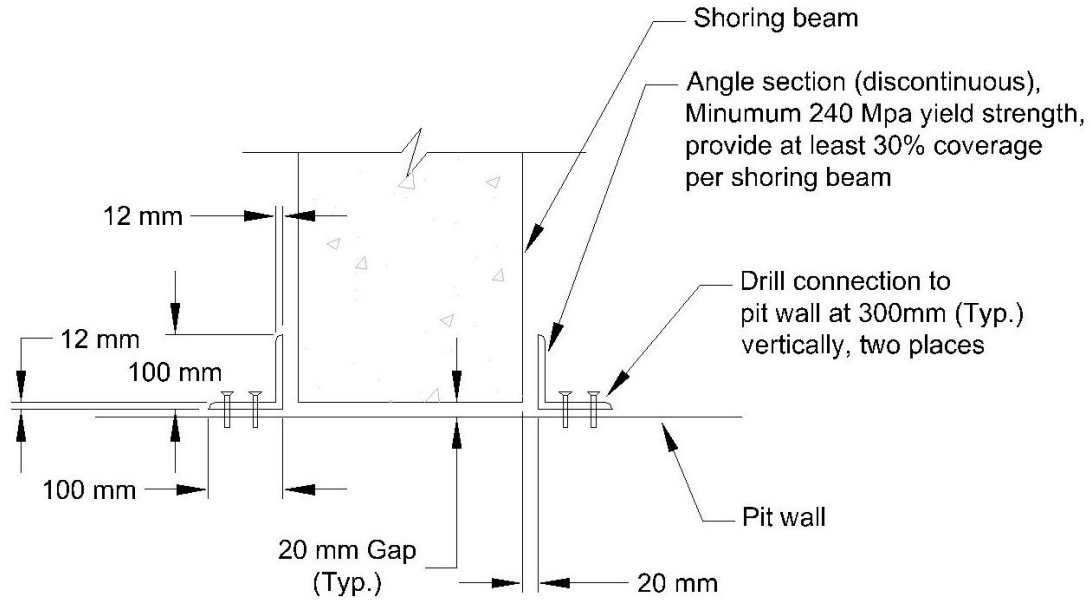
Schematic. Plan view of shoring beam connection to pit wall.
